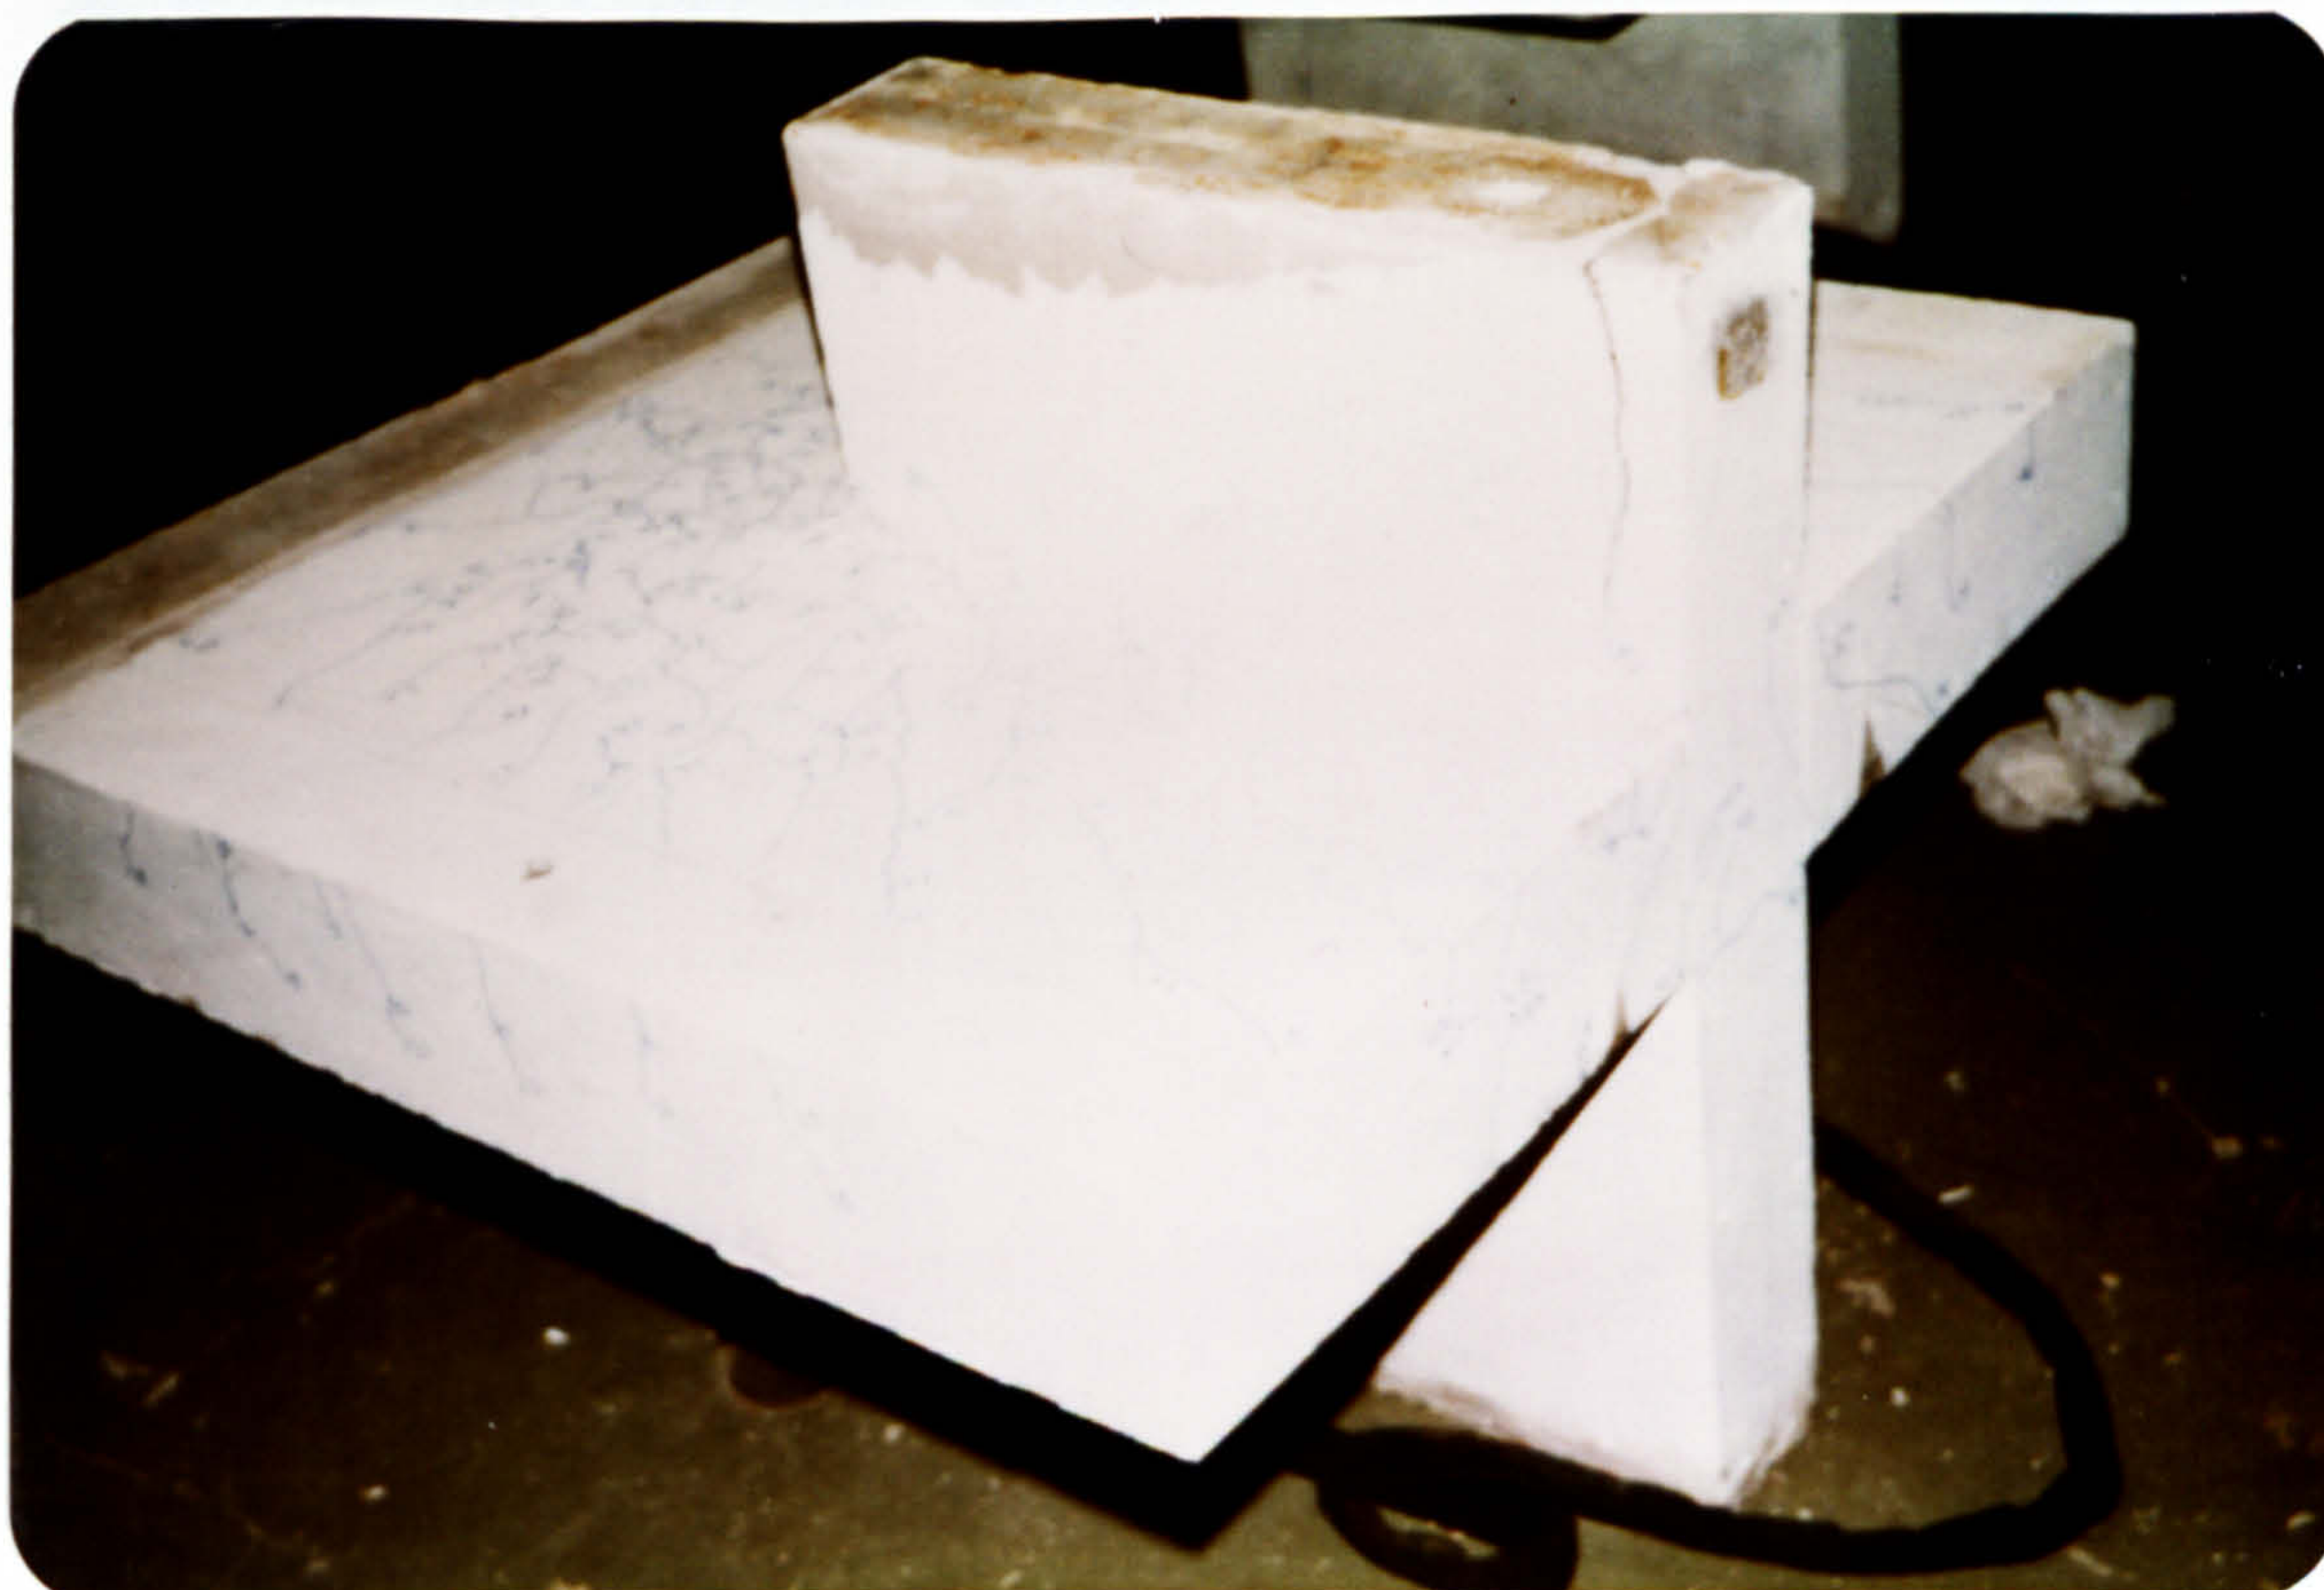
Shear crack in the slab at the back of model MT2 after its failure.
